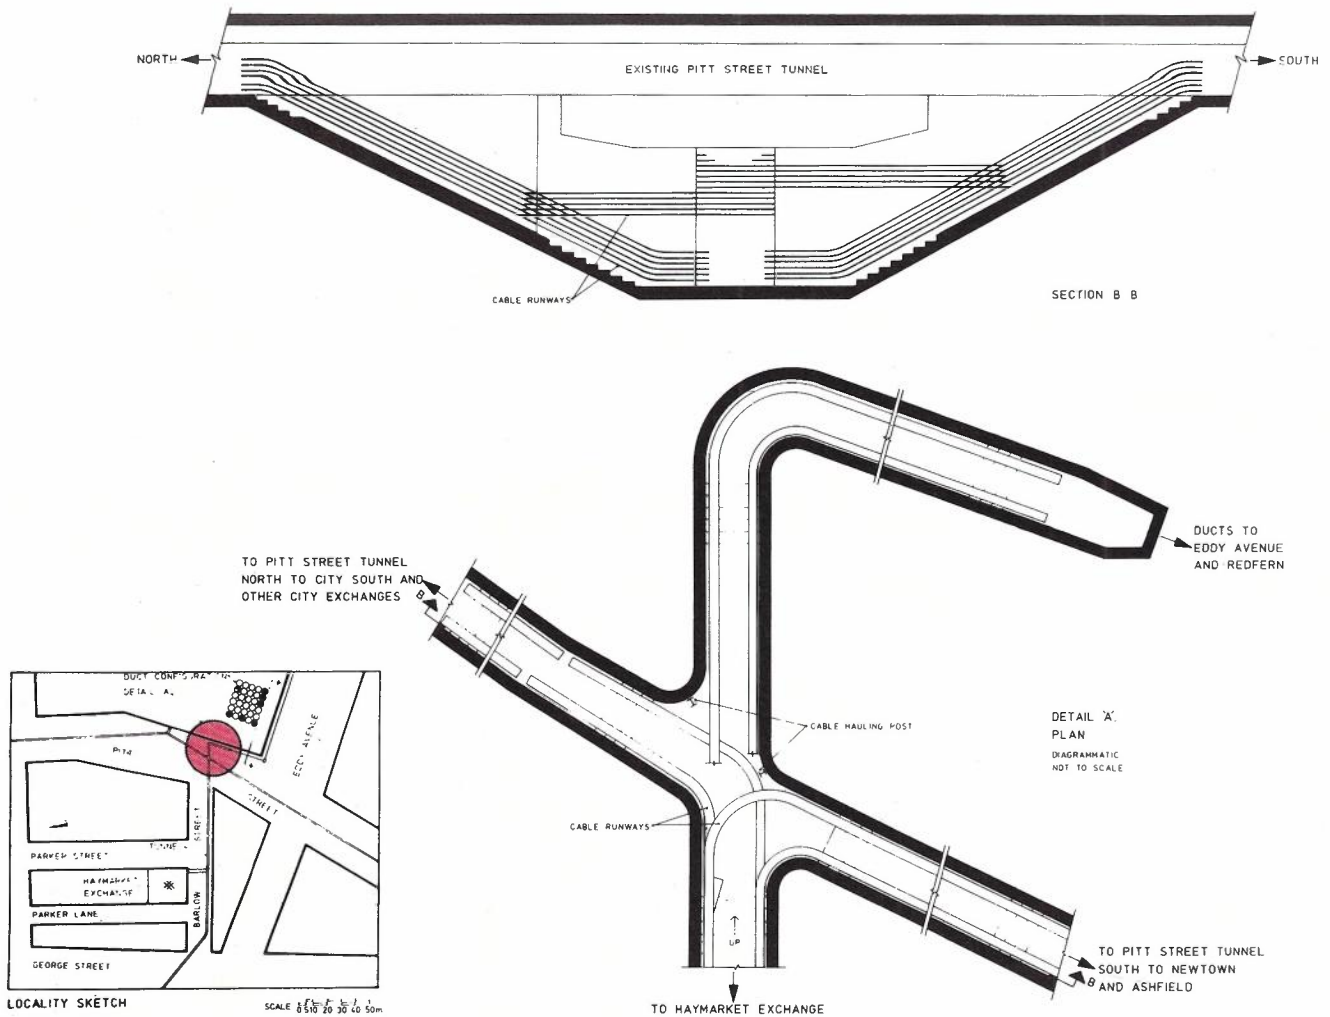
Intersection, Pitt St. Tunnel and Haymarket Exchange Break-off (General Arrangement).
